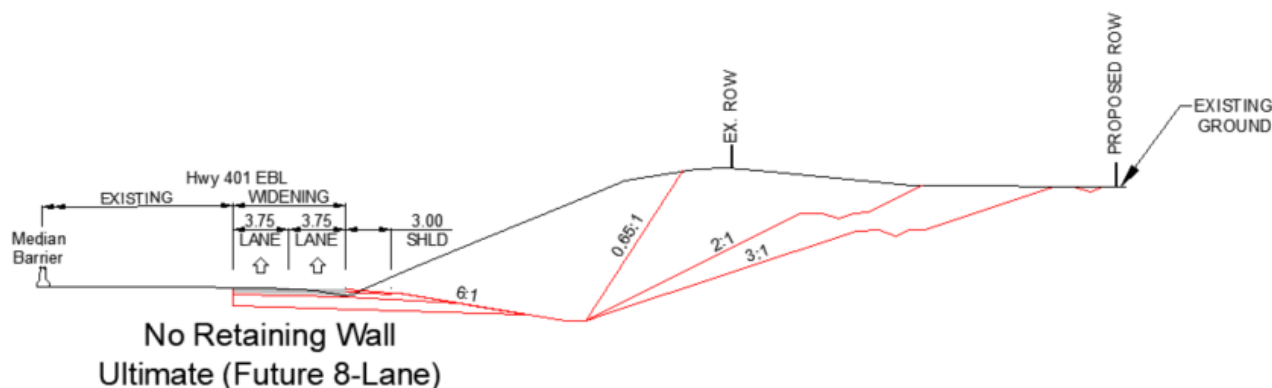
Preliminary Highway 401 Cut Slope Cross Section – 8-Lane Highway Configuration
